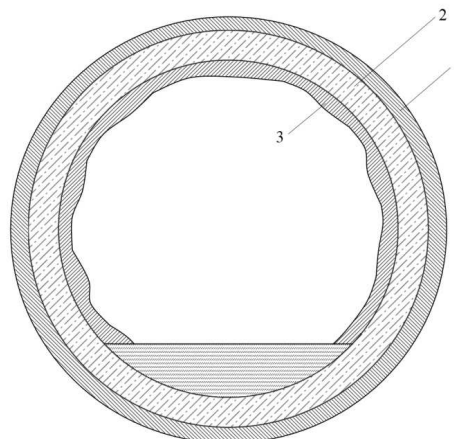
The proposed construction of a fiber-reinforced lining: 1 is the layer of reinforced foam concrete; 2 is the layer of precast fiber concrete; 3 is the sprayed concrete layer.
